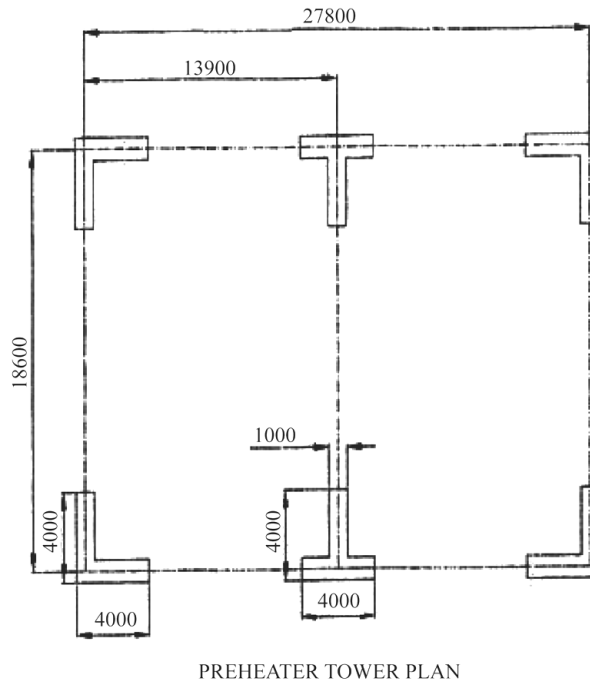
Typical plan (top view) of R.C.C preheater tower in cement plant. (All dimensions are in mm).
